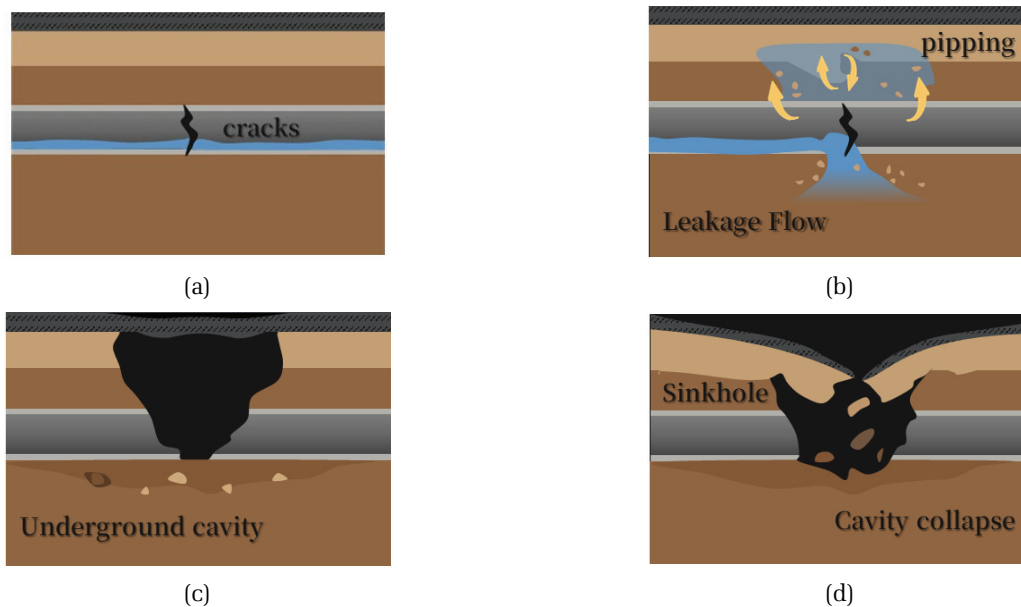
Mechanism of sinkhole development induced by sewer pipe leakage: (a) pipe defect, (b) soil particle loss and piping, (c) expansion of underground cavity, and (d) ground collapse due to cavity failure.
